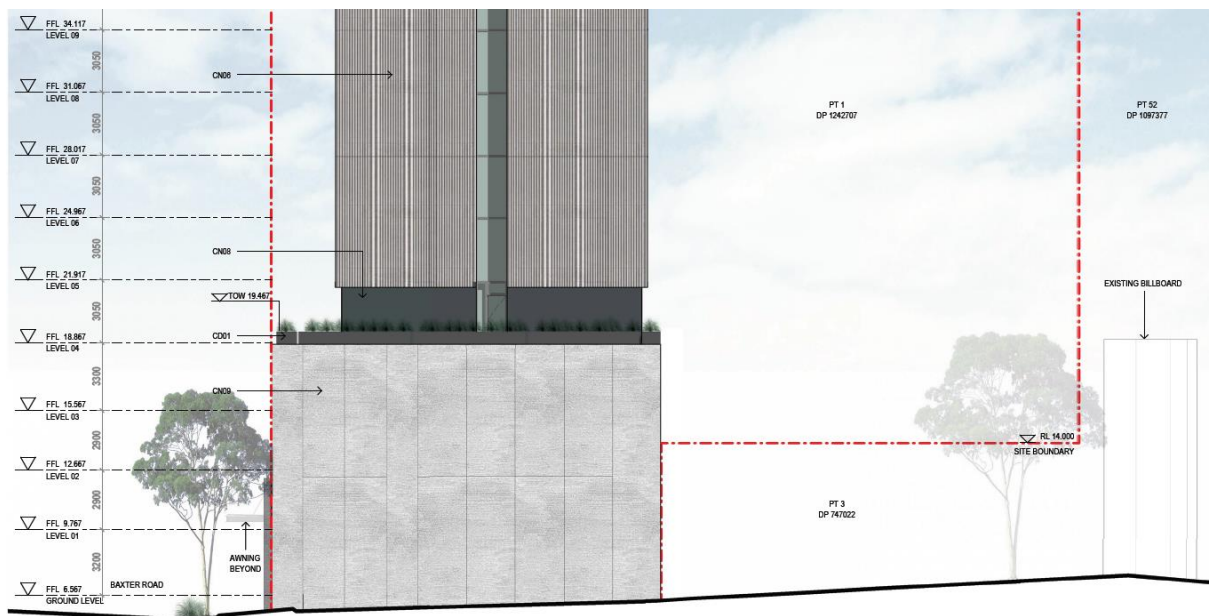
Extract from West Elevation Plan (Source: Group GSA plan DA 207)
